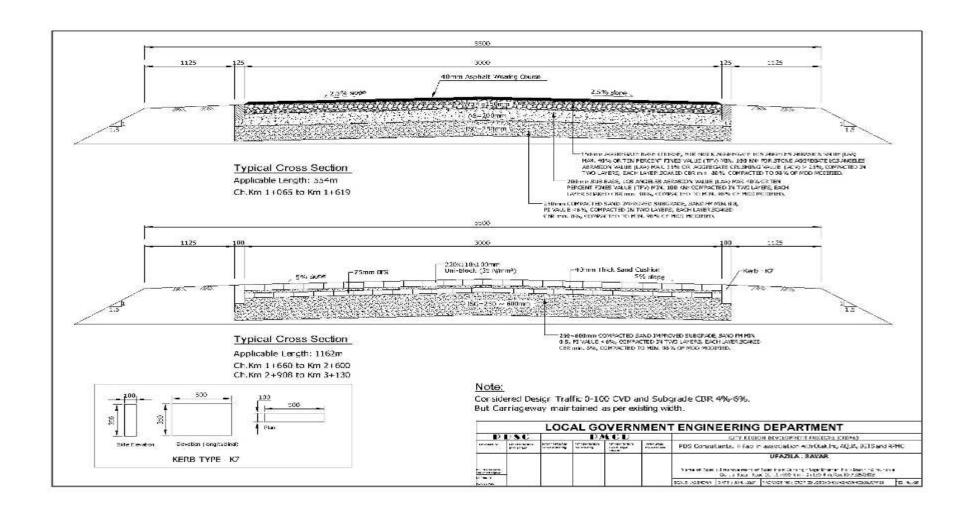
Typical cross section (Ch. 1+065 to 1+619 km, Ch. 1+660 to 2+600 km & 2+908 to 3+130 km)
